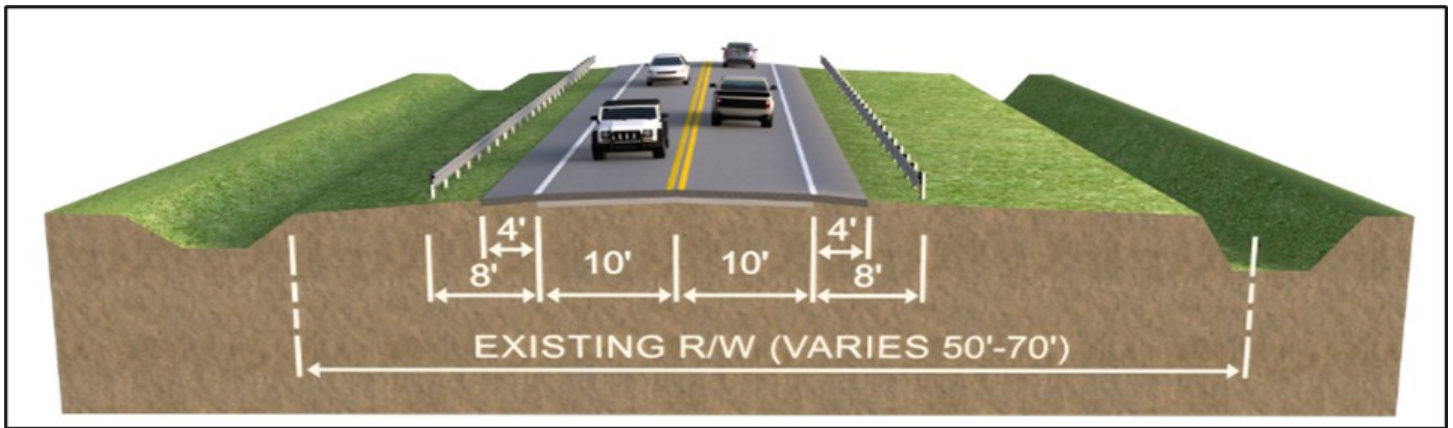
Existing S.R. 70 Typical Section from Lonesome Island Road (Begin Project) to Harney Pond Canal C-41 and From Indian Prairie Canal C-40 to C.R. 721 (End Project)
